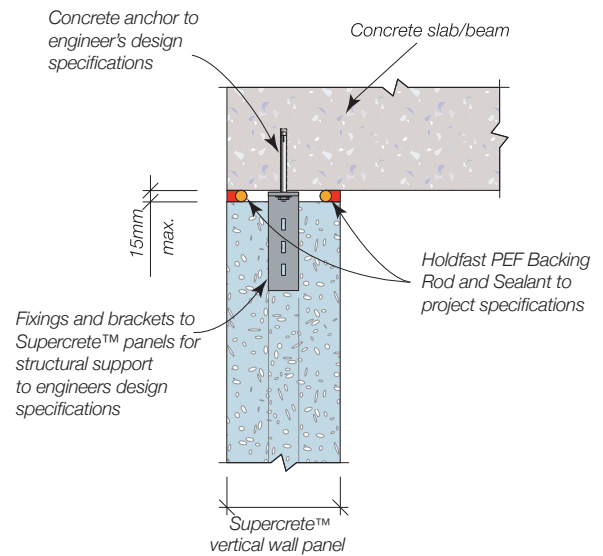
Vertical wall panel straight line control joint junction detail.
